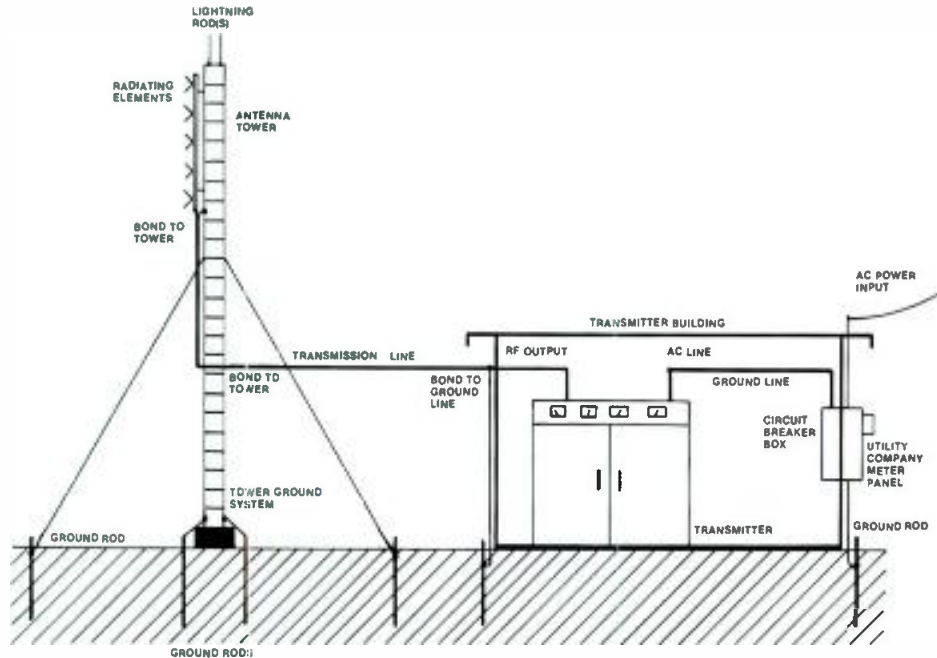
The typical, but not ideal, grounding arrangement for a transmission facility using a grounded tower. A better configuration involves the use of a bulkhead panel through which all cables pass into and out of the equipment building.
